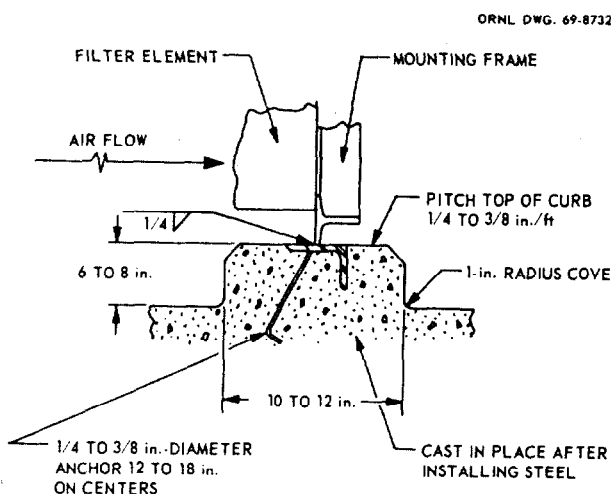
Embedded structural member for seal-welding filter mounting frame to a concrete floor. Note anchor bolts, curbs, and seal weld from air-entering side.
